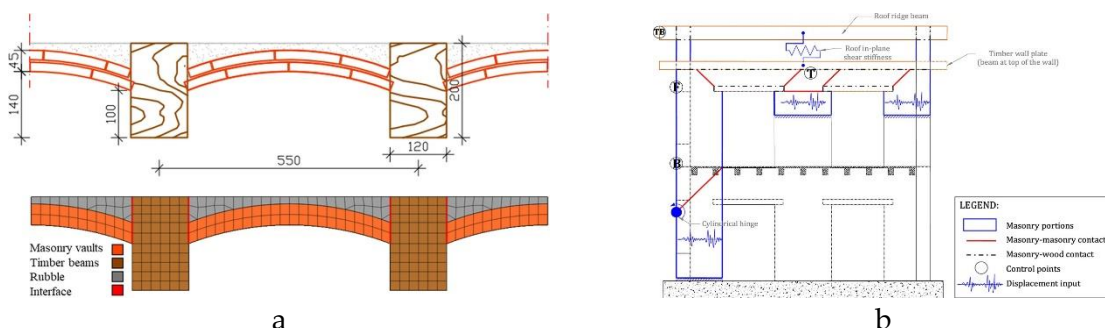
a) Finite element model Jack arch floor with timber beams and masonry vault from [90], and b) Numerical model representation from [91]
